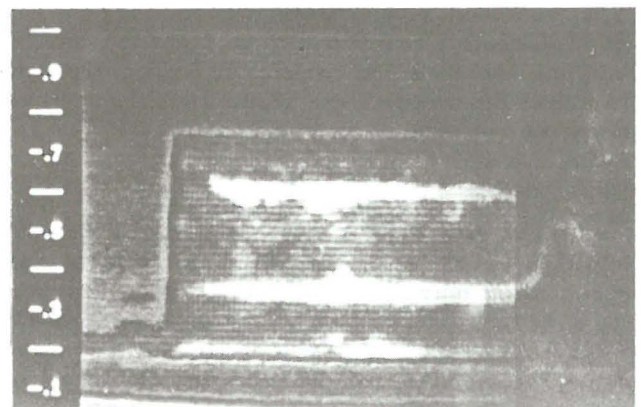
Infrared photo of insulated masonry cavity wall. Horizontal bands of white indicate locations of mortar droppings in cavity.
